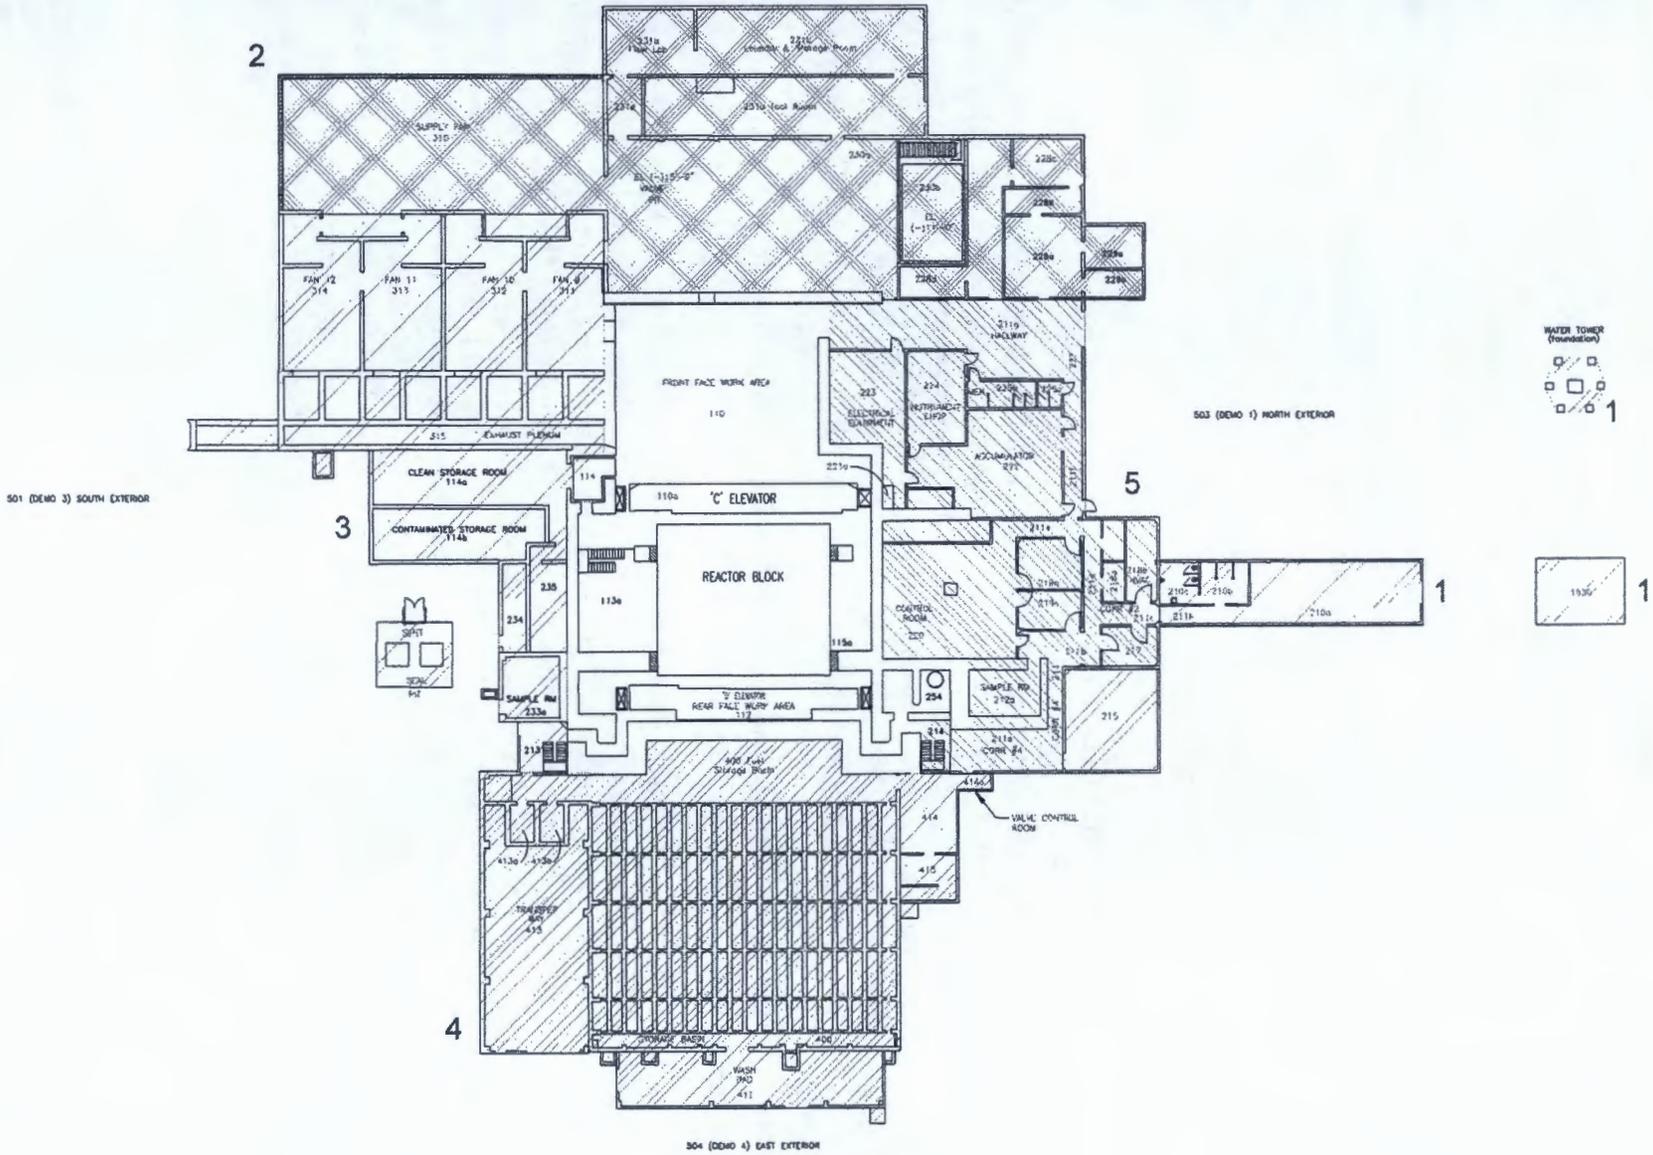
General Plan of 105-F Safe Storage Enclosure at Ground Level.
